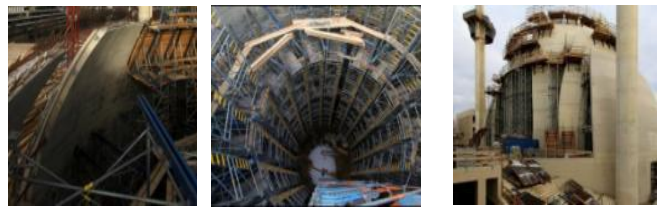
The formwork and reinforced concrete material cast-in-situ [19]
